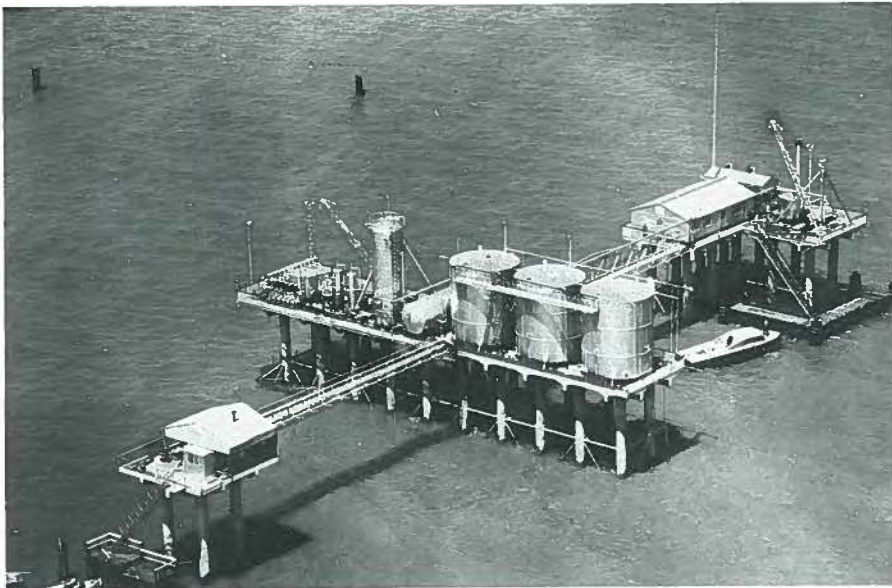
Offshore Oil Structures in the Gulf of Mexico constructed in early 1950, showing cylindrical piles and precast deck unit.
